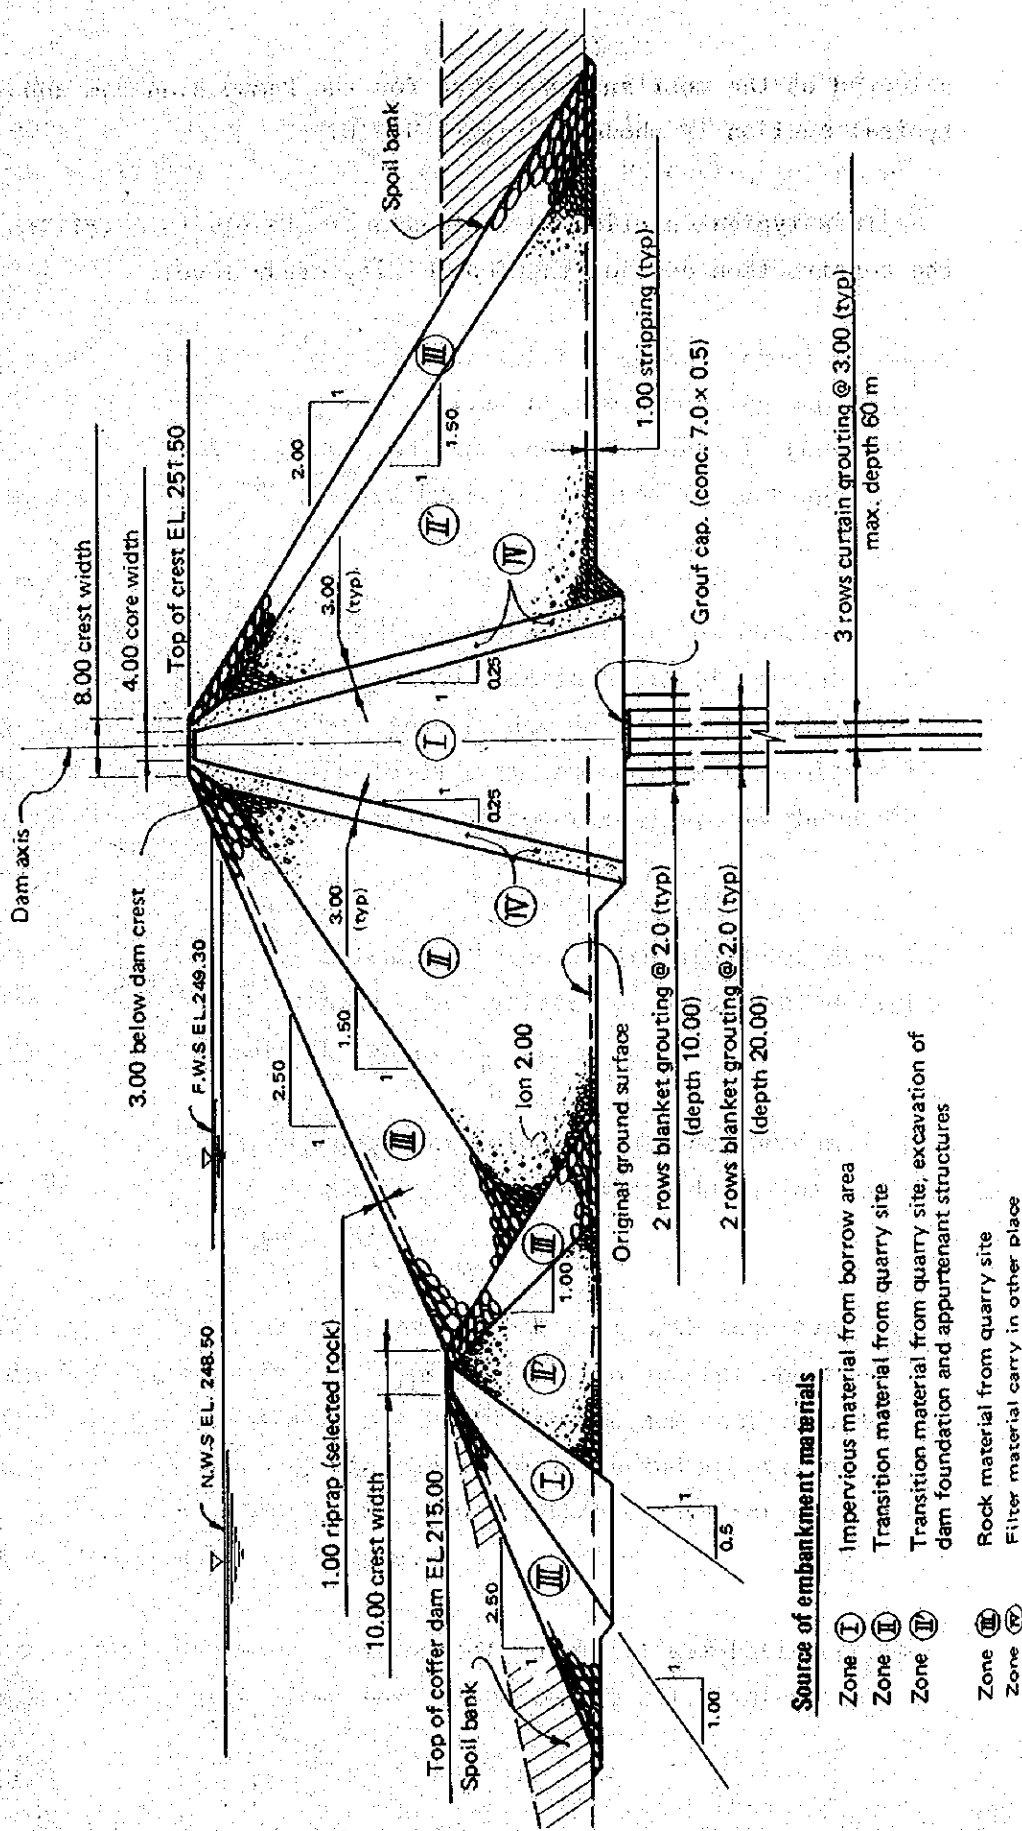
D-10. ASSUMED TYPICAL SECTION OF CENTER CORE TYPE FILL DAM
